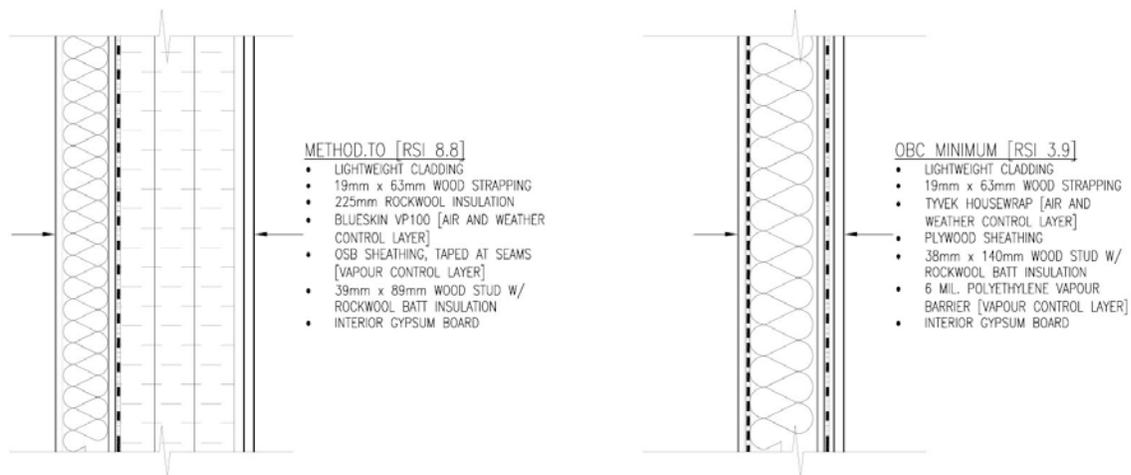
METHOD.TO Construction versus Standard Practice Ontario Code Minimum Construction.
